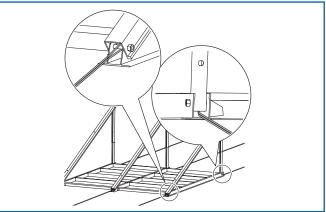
Flat roof support with ballast trays and additional guy ropes
